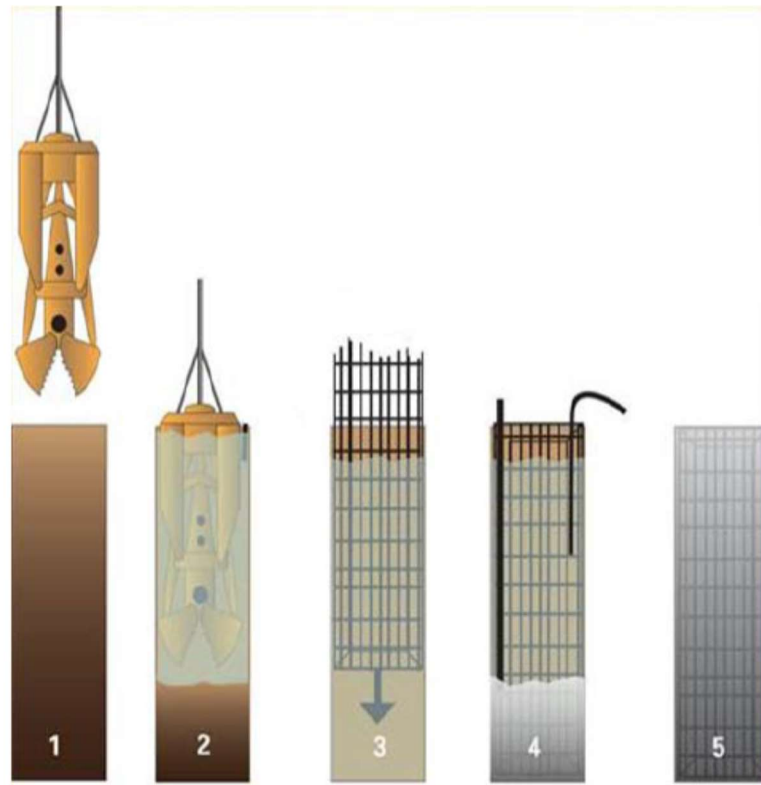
Diaphragm walls-Slurry wall steps of running [23]
